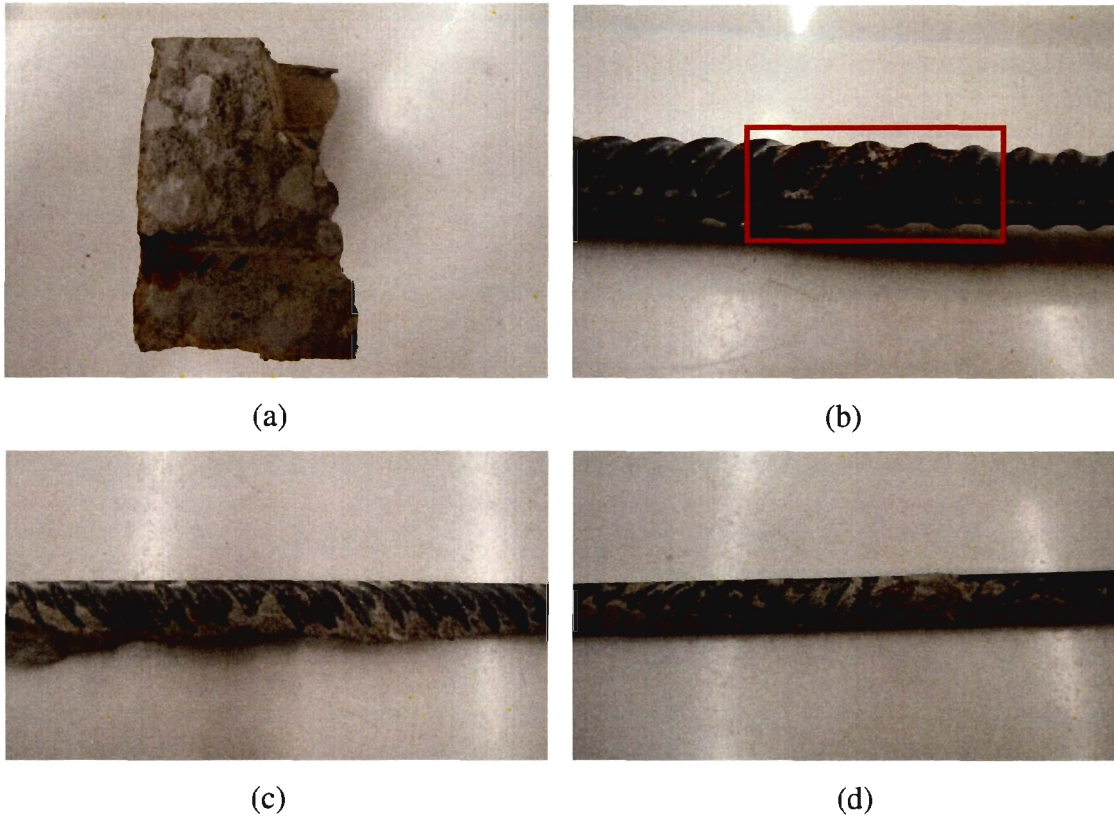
Reinforcement examination of Mix No. 3 containing 2 bars.
